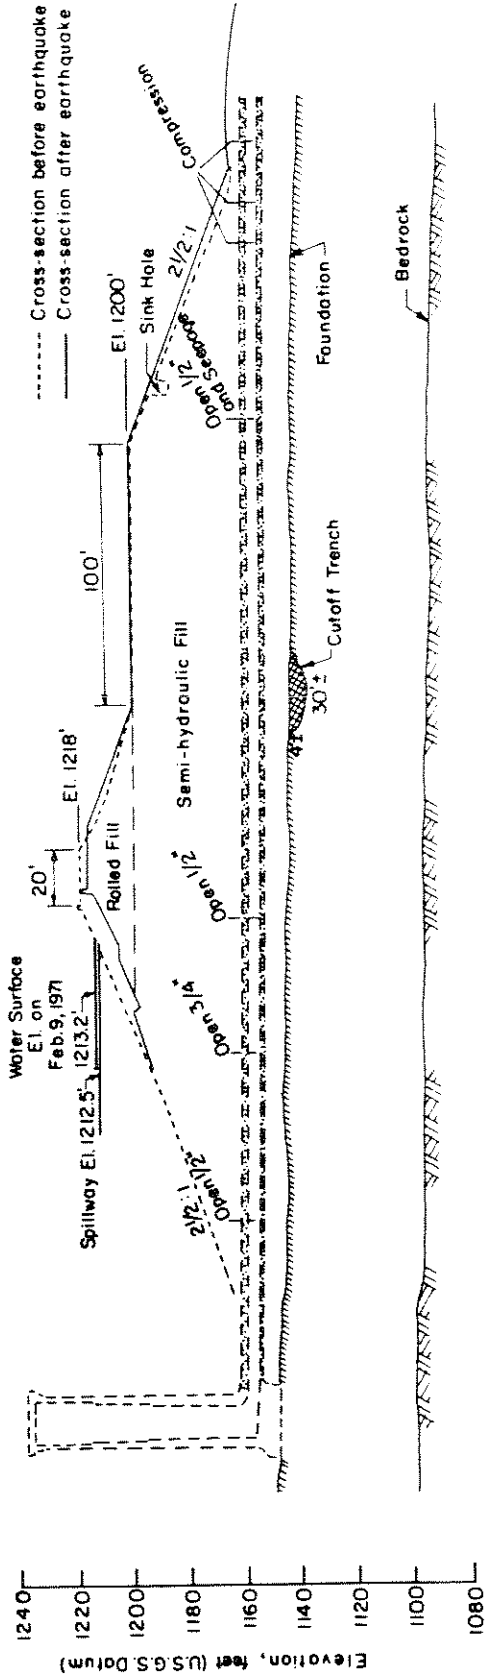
CROSS-SECTION THROUGH UPPER SAN FERNANDO DAM.
